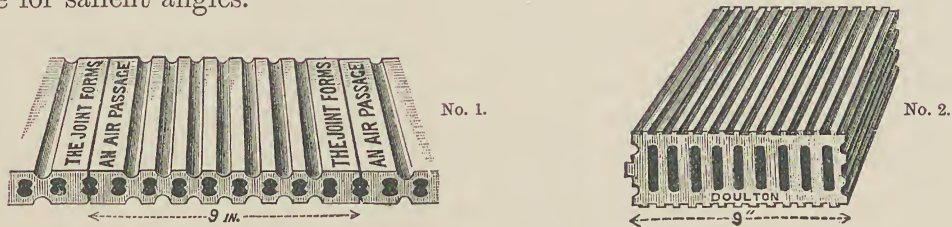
Vitrified Stoneware Ventilating Damp-course, $1\frac{1}{2}$, $2\frac{1}{2}$, and 3 inches thick, with Open Joints.
